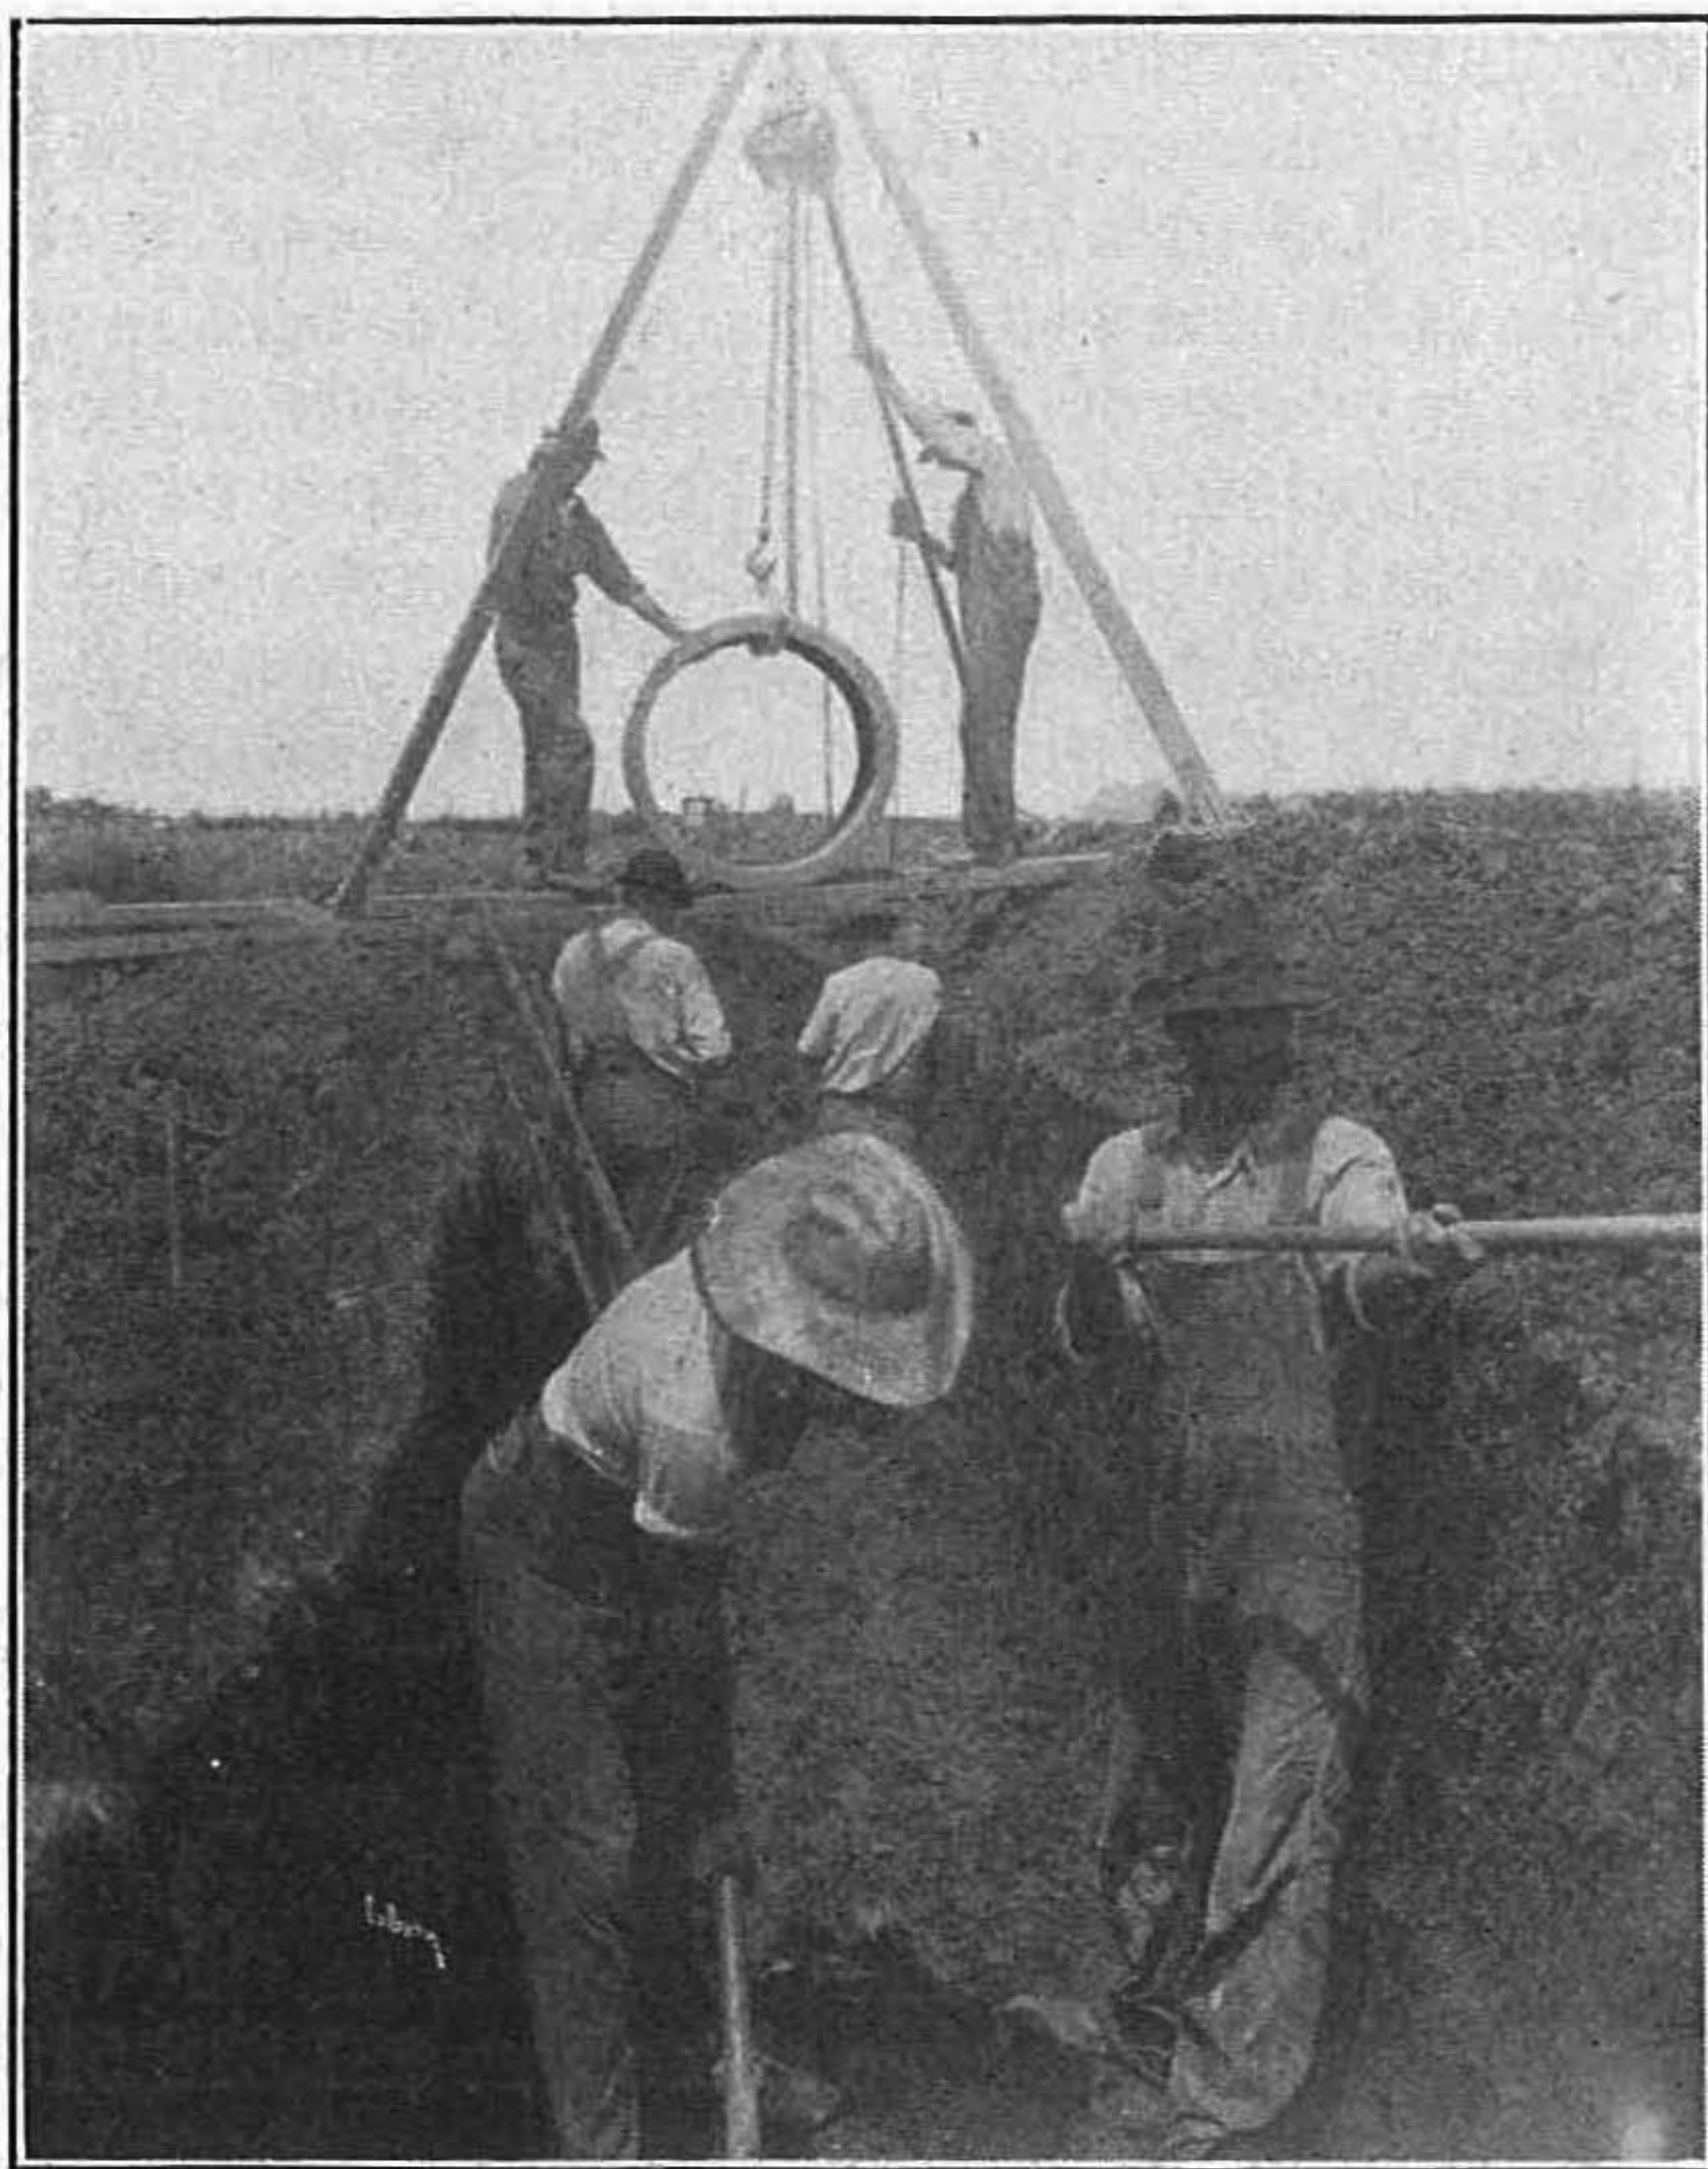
The Construction of a 36 Inch Tile Drain in Boone County, Iowa.
